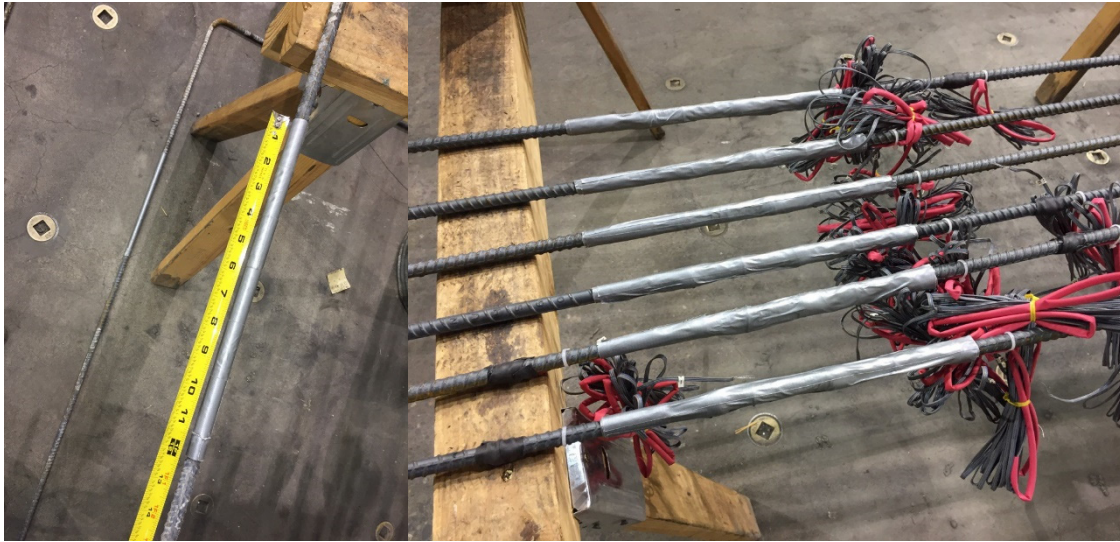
Column LD-S3-G60D: longitudinal bars debonded by duct tape.
